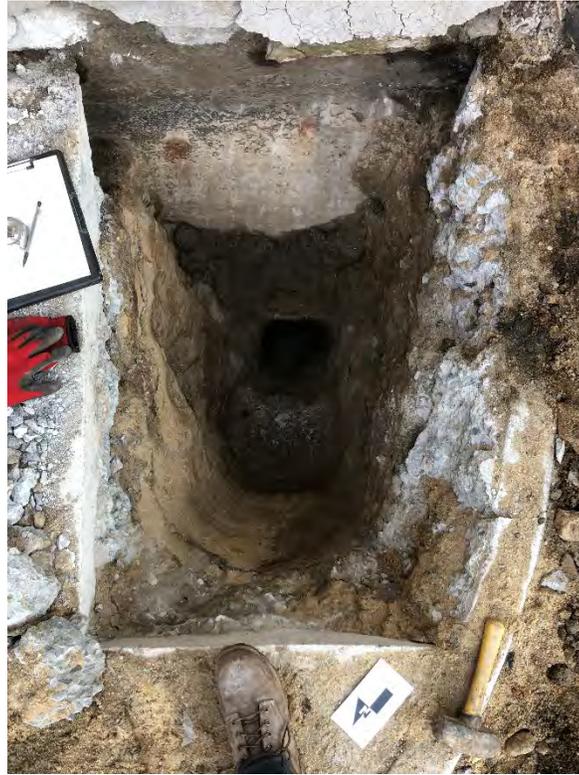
Test Pit TP-41A-1 upon completion (facing southeast)
